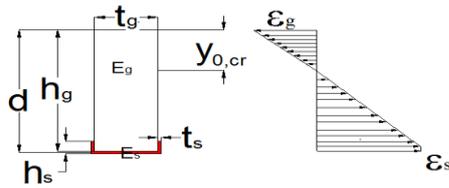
Cross-Section for Yielded Reinforced Glass Beam
